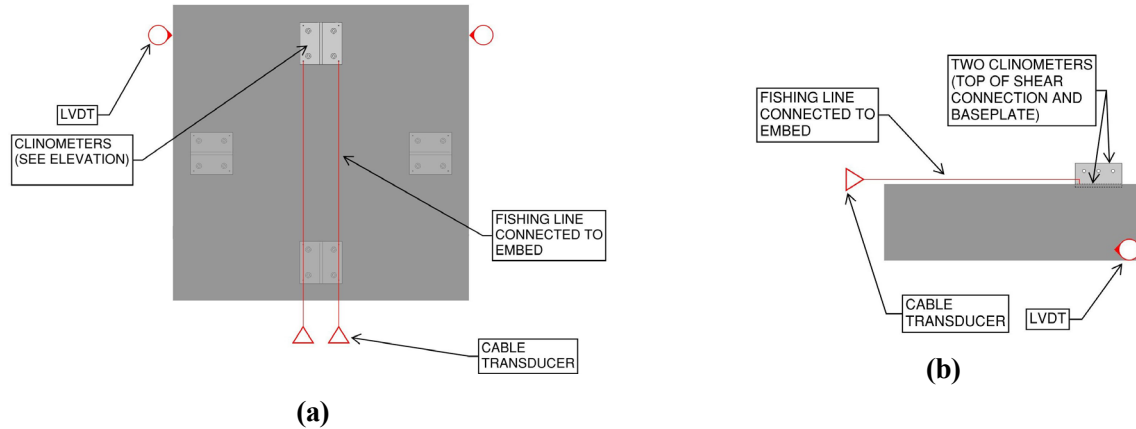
Schematic of instrumentation used in the test program. (a) Plan view and (b) section view
